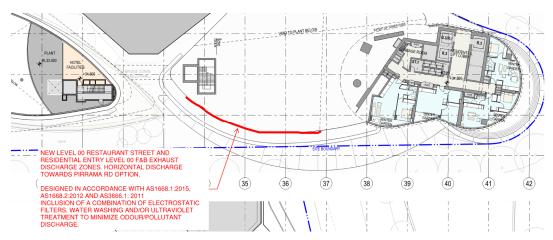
Level 06 Plan view - Residential Entrance Level Restaurant (Level 00) and New Restaurant Street Level 00 exhaust discharge location.
